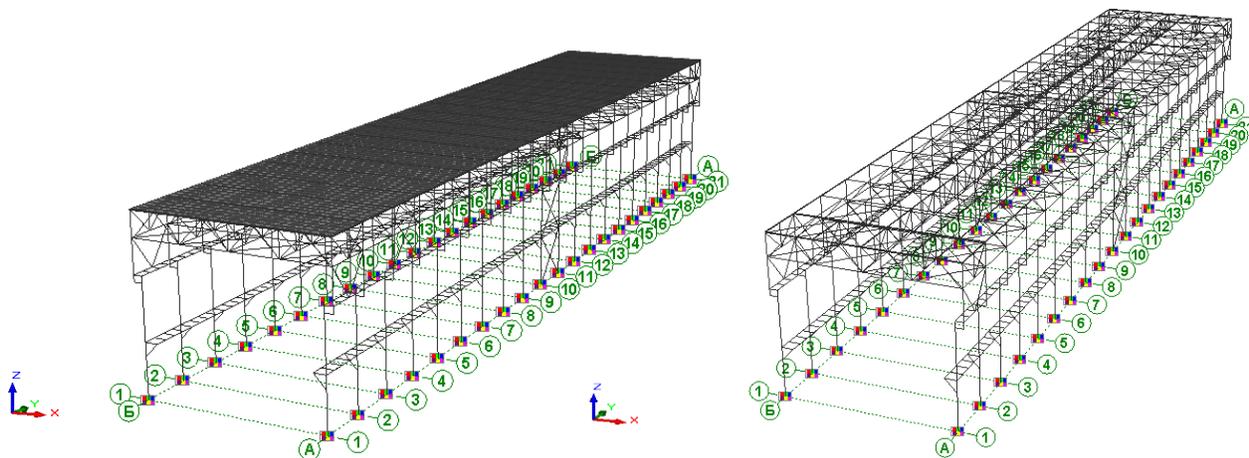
Spatial design models of industrial building: a) with a «heavy» coverage (prefabricated concrete panels); b) «light» coverage (profiled steel on purlins)
